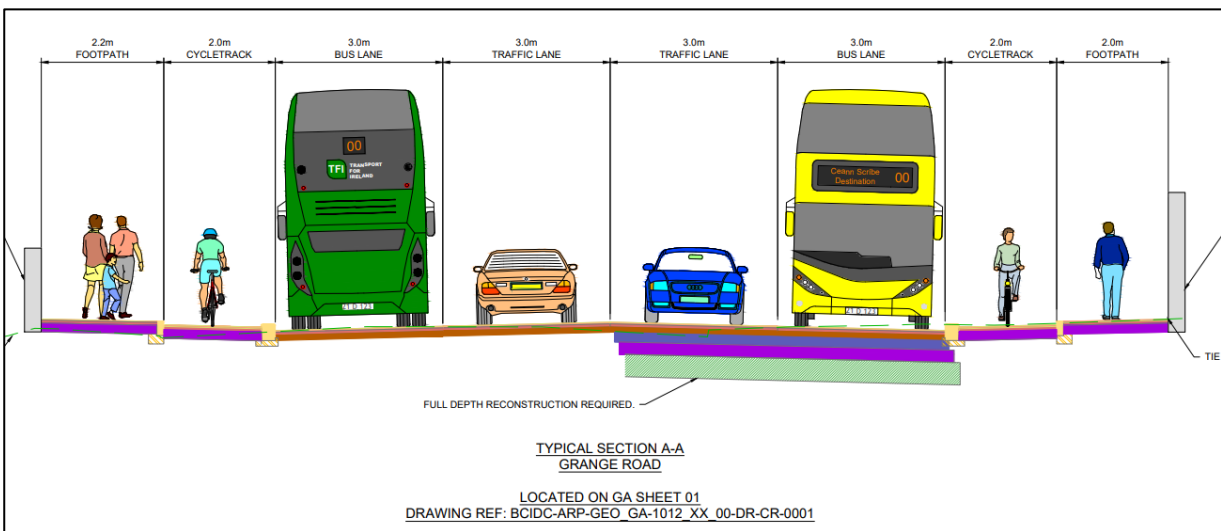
Typical Cross Section adjacent to Grange Road/Nutgrove Avenue Junction
